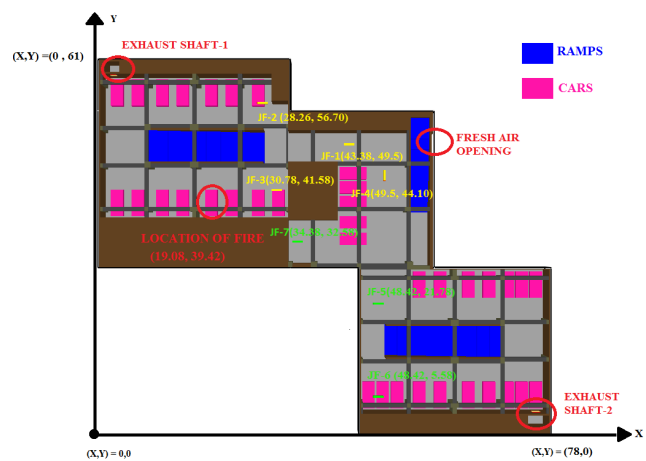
The Jet fans, exhaust shafts and fresh air openings
